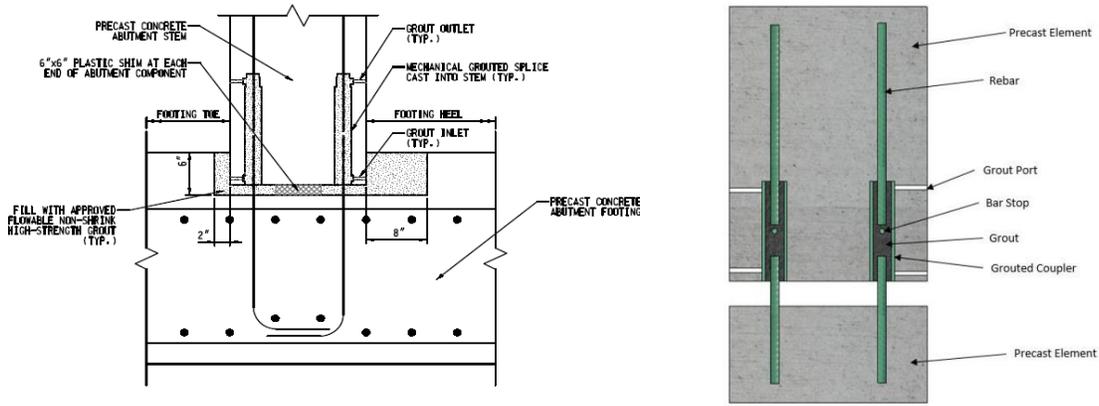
64 Precast abutment stem to precast footing connection [[8], [79]]
